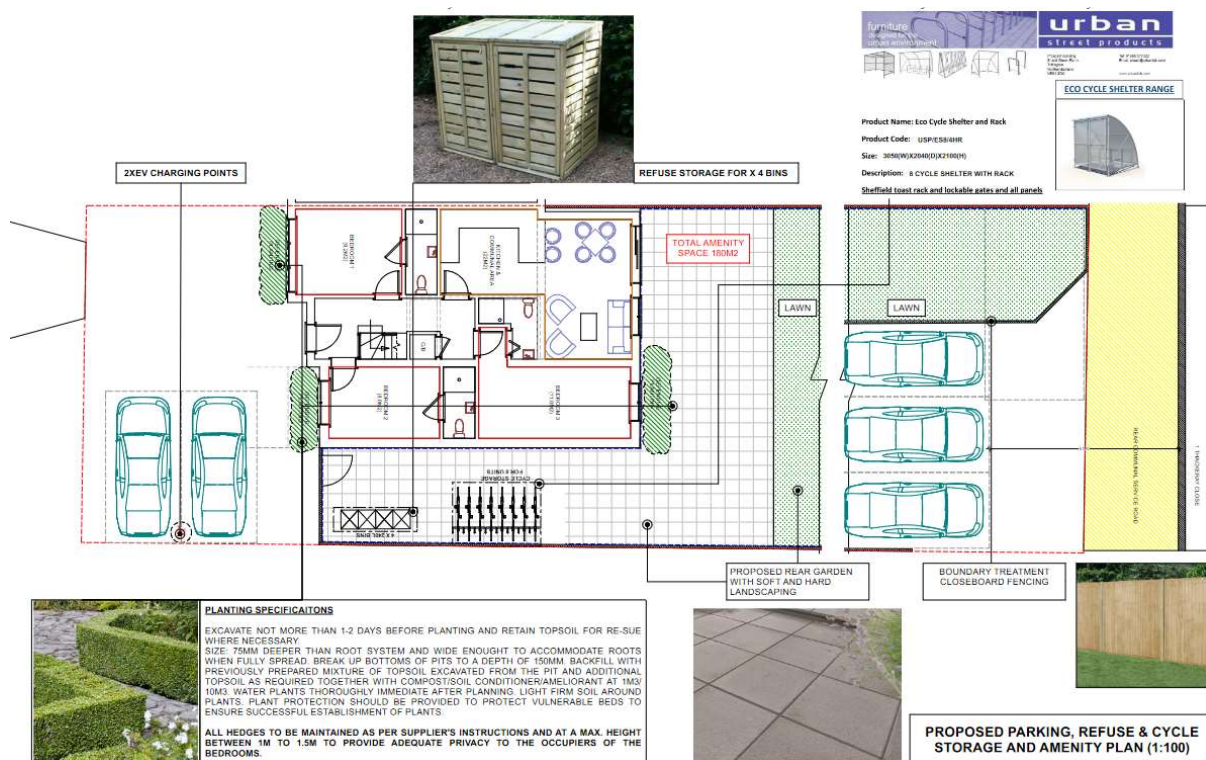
Shows the proposed parking, refuse & cycle storage and landscaping plans
